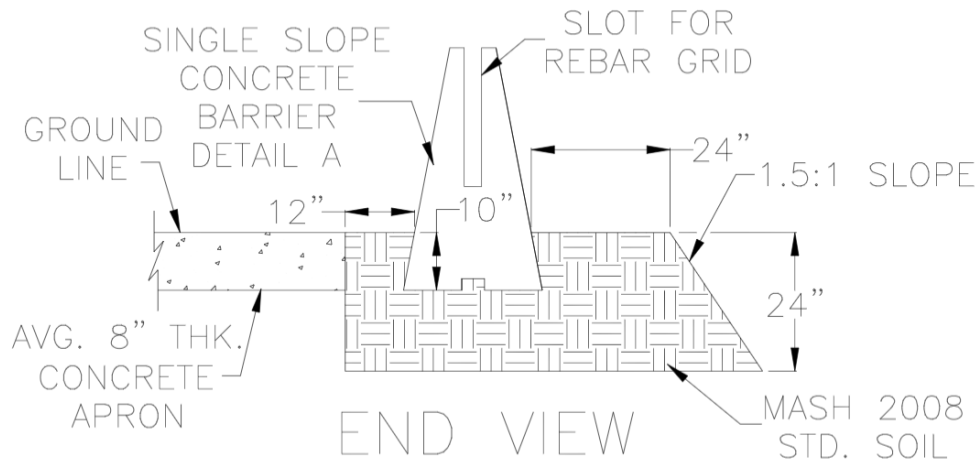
42-inch Tall Single Slope (TTI Test Number 405160-13-1)
